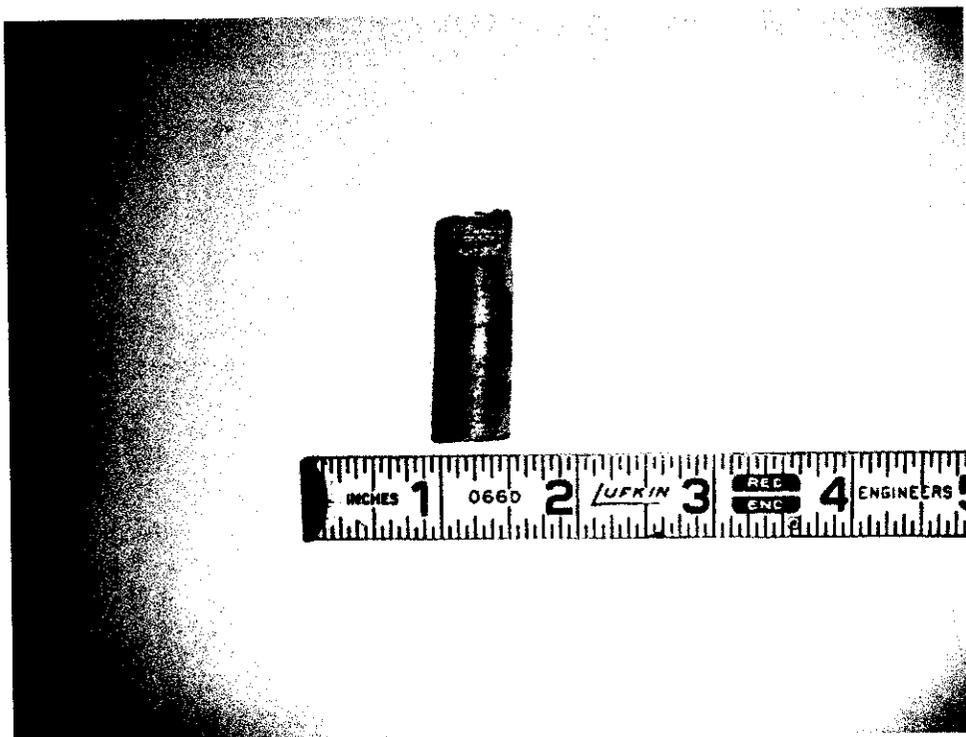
Wood core sample from Stringer-Span 5, interior face.
